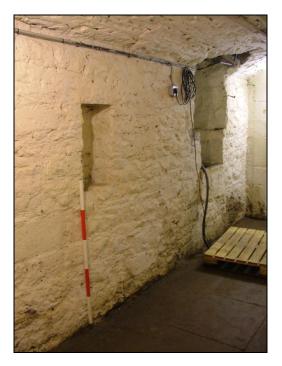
Niche and stone sink with semi-circular feature above, north-west wall of cellar (Scale = 1m)
